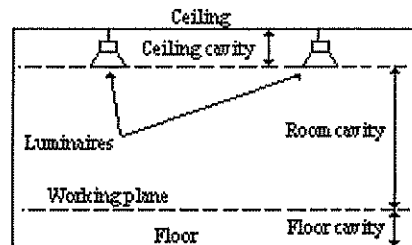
Working plane height (floor cavity) and luminaires suspension height (ceiling cavity)
